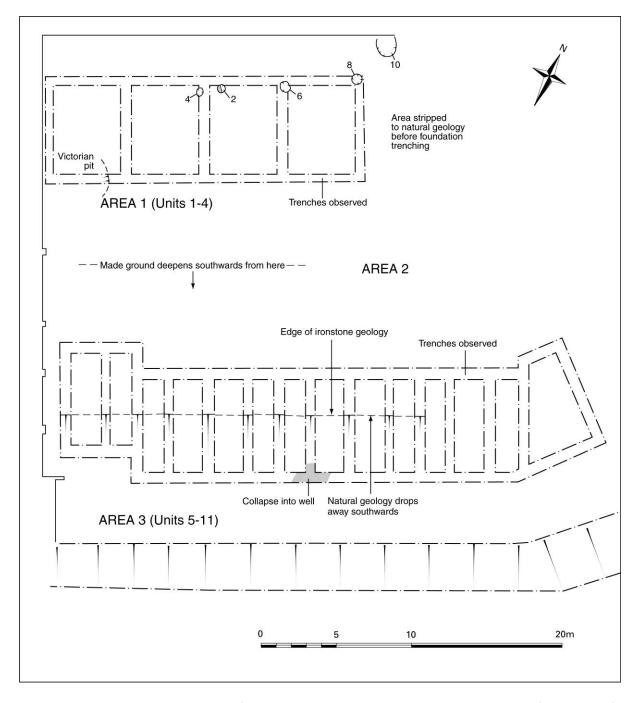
Plan showing Areas 1-3, strip, foundations as dug and archaeology encountered (Andy Isham)
